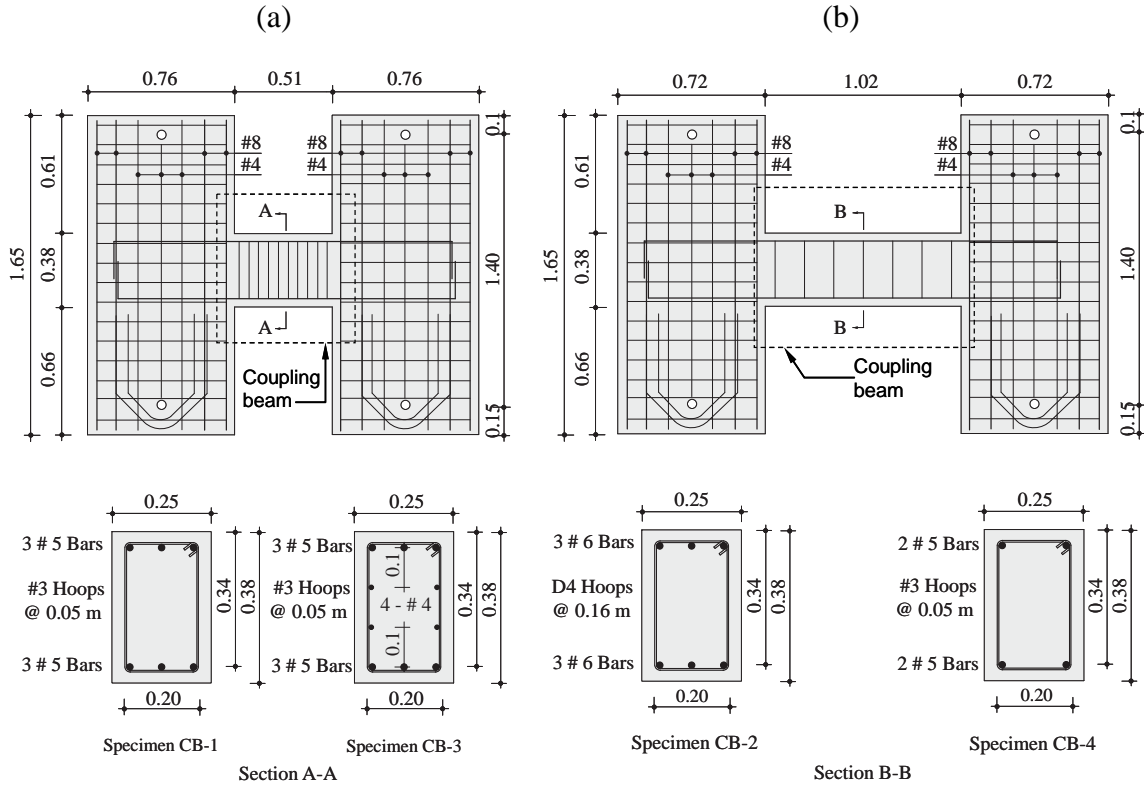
Specimen geometry and reinforcing details (dimensions in [m]): (a) specimens CB-1 and CB-3; and (b) specimens CB-2 and CB-4
